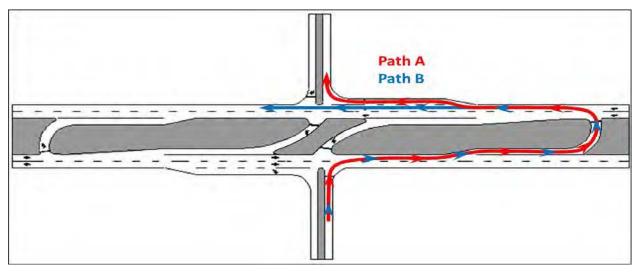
SR 53 at Oakwood Road/Frontage Road Study Site
